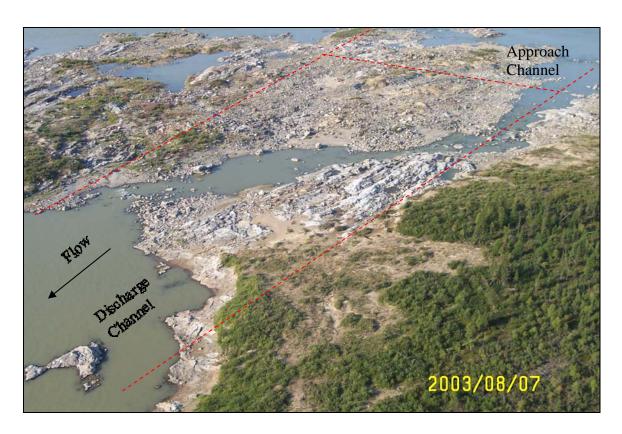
View looking southwest, showing Spillway Area and Discharge Channel.
